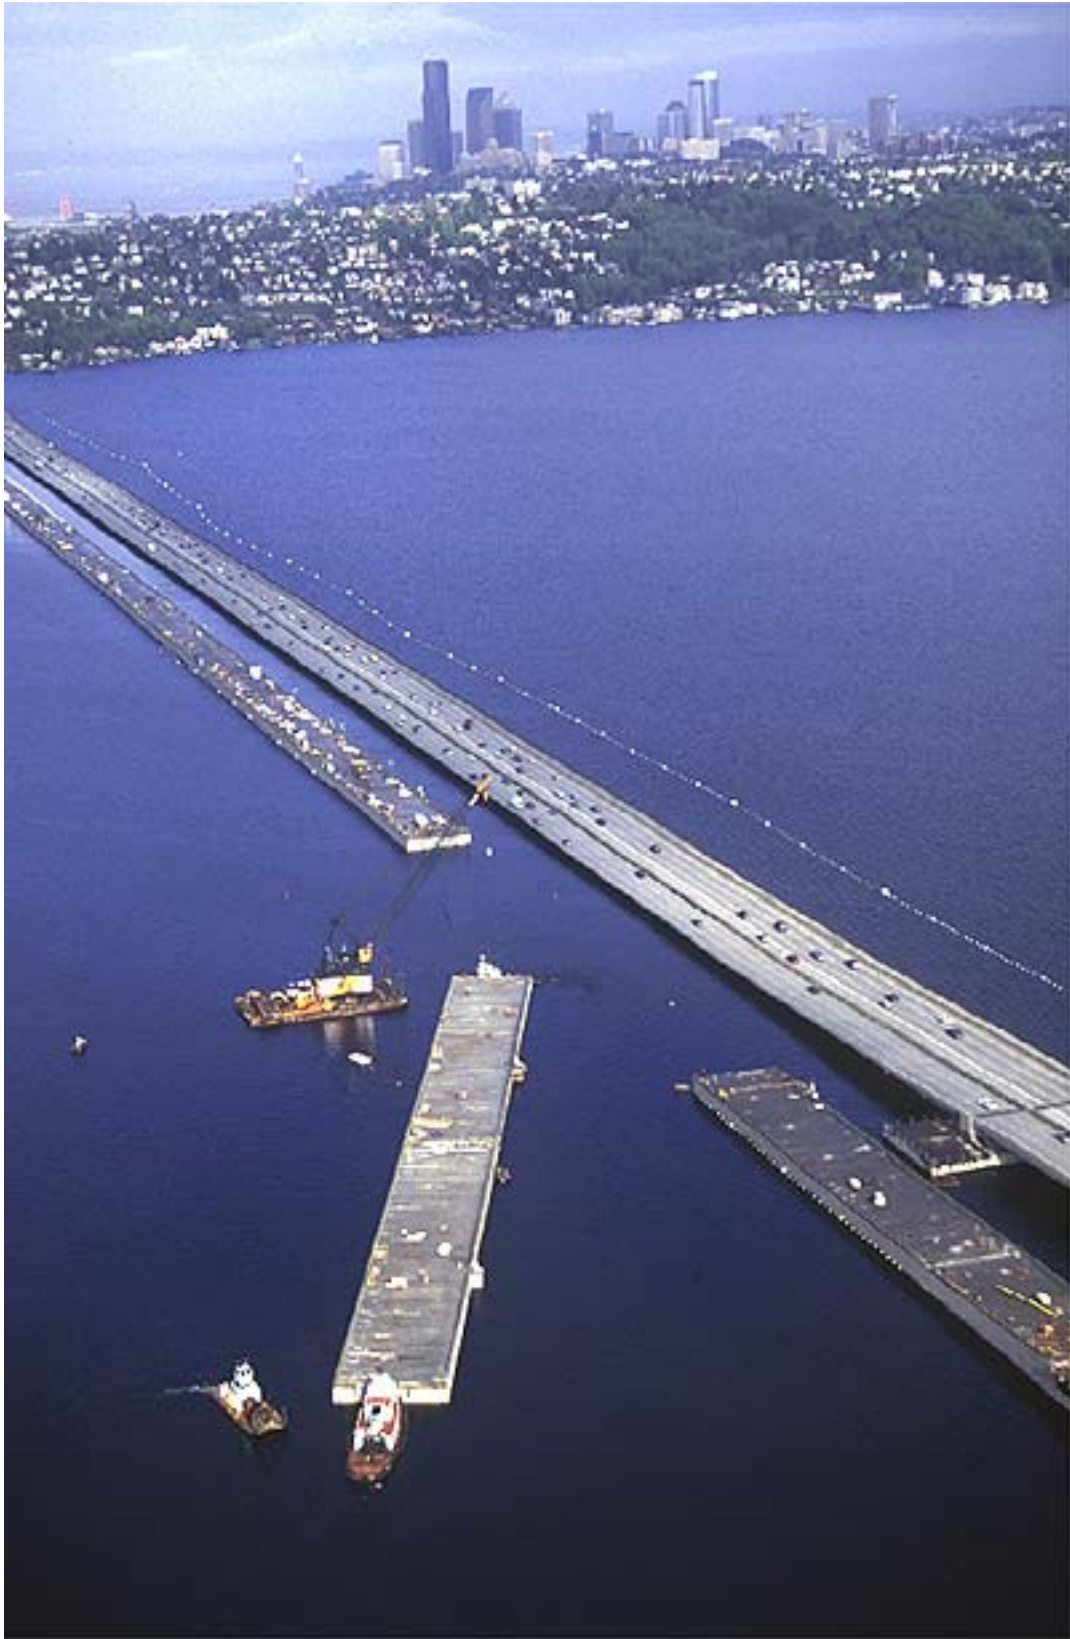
Assembly of Pontoons: Lacey V. Murrow Replacement Bridge
